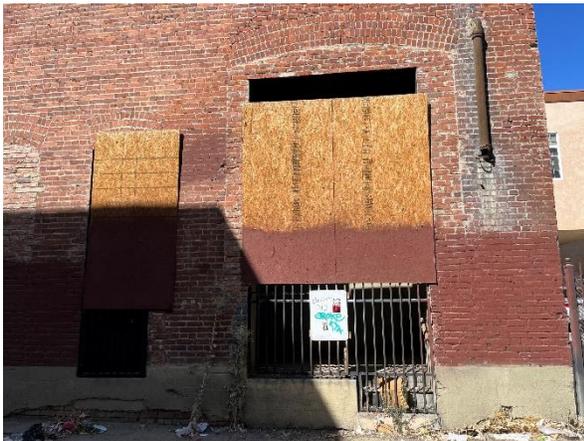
South corner of the southwest (rear) façade, facing northeast. Large, recessed entrance with four course brick arch above (right) and opening with metal grille (right).
